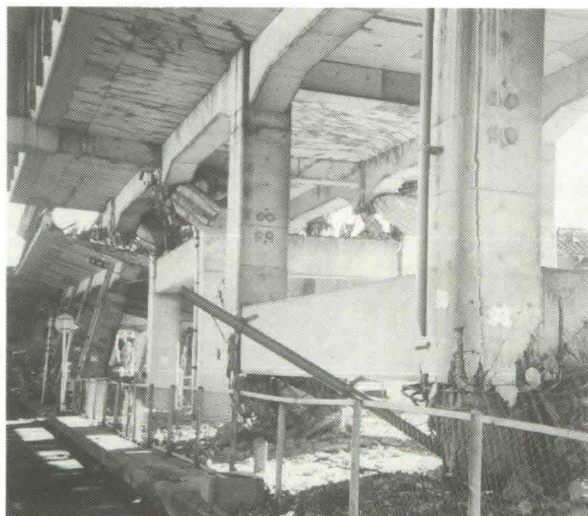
Collapse of double-deck rigid-frame viaduct (Hansui Viaduct, Sanyo Bullet Train in Nishinomiya City)
